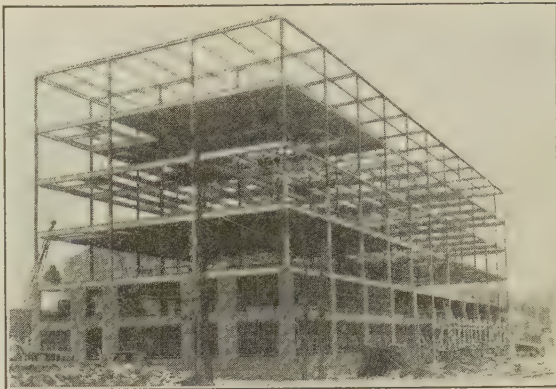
LARGEST ARC-WELDED BUILDING PRODUCED TO DATE
